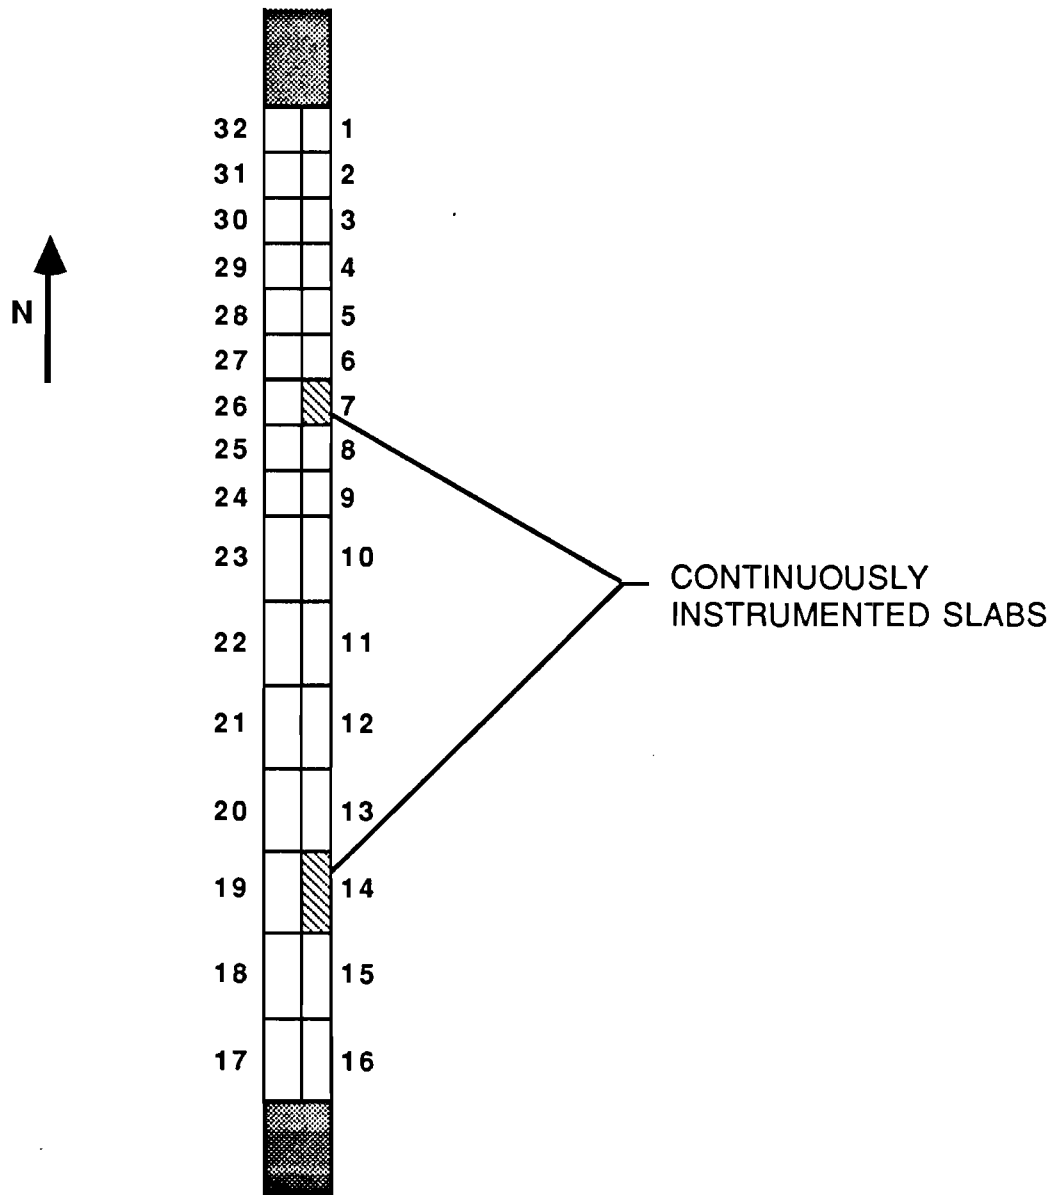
Numbering system for the prestressed concrete pavement slabs for the Texas prestressed pavement.
